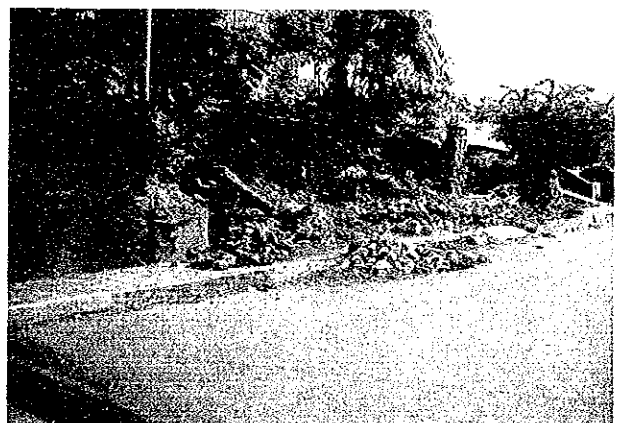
Collapse Example of Retaining Wall, Ende City
